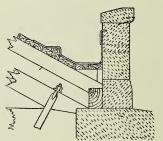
Gutter, showing Raglet in Stone Parapet.
